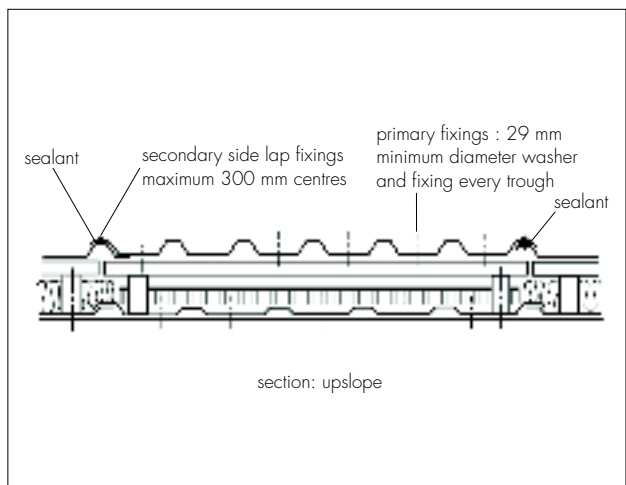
Fixing detail for site-assembled rooflights — side laps, overlap/overlap
